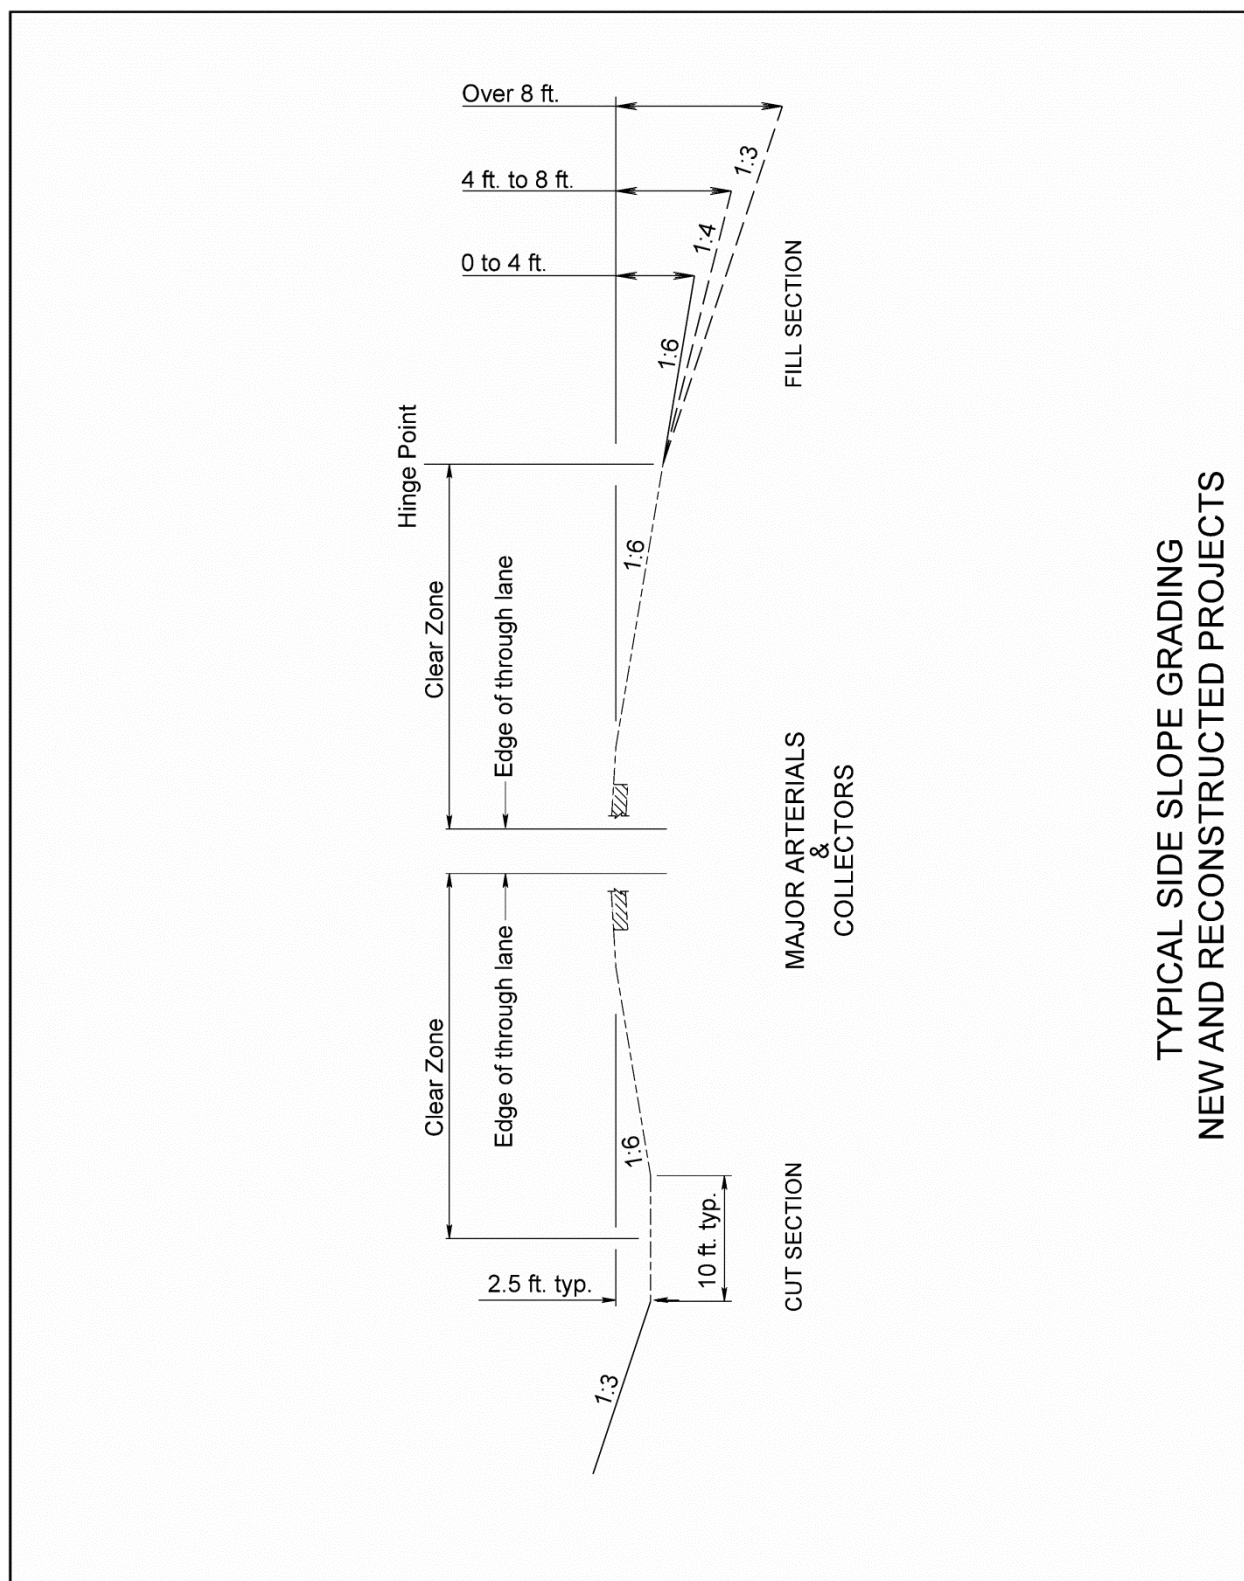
Typical Side Slopes for New and Reconstructed Projects
